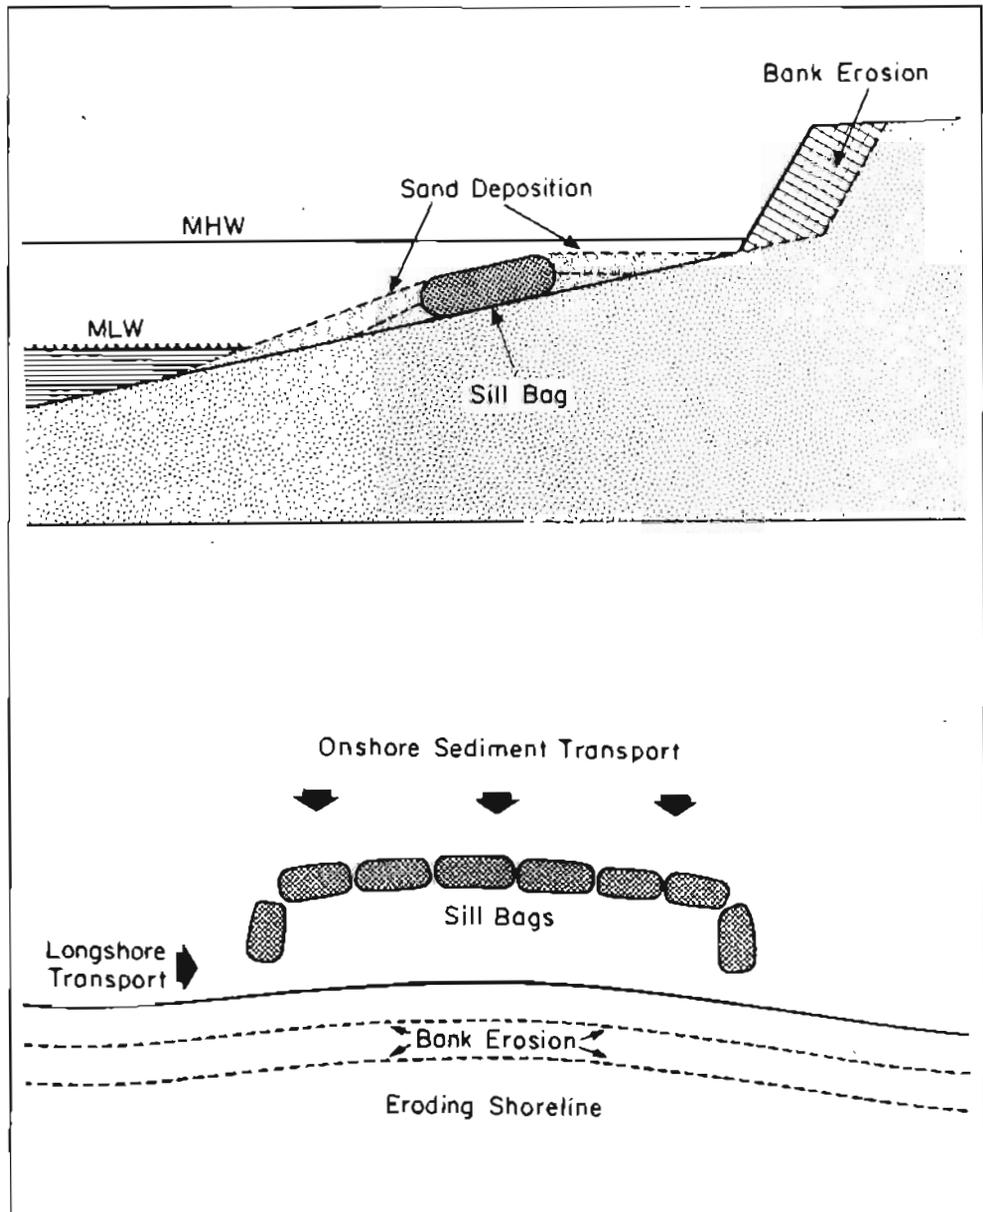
Schematic Section (top) and plan (bottom) view of a sill bag perched beach.
